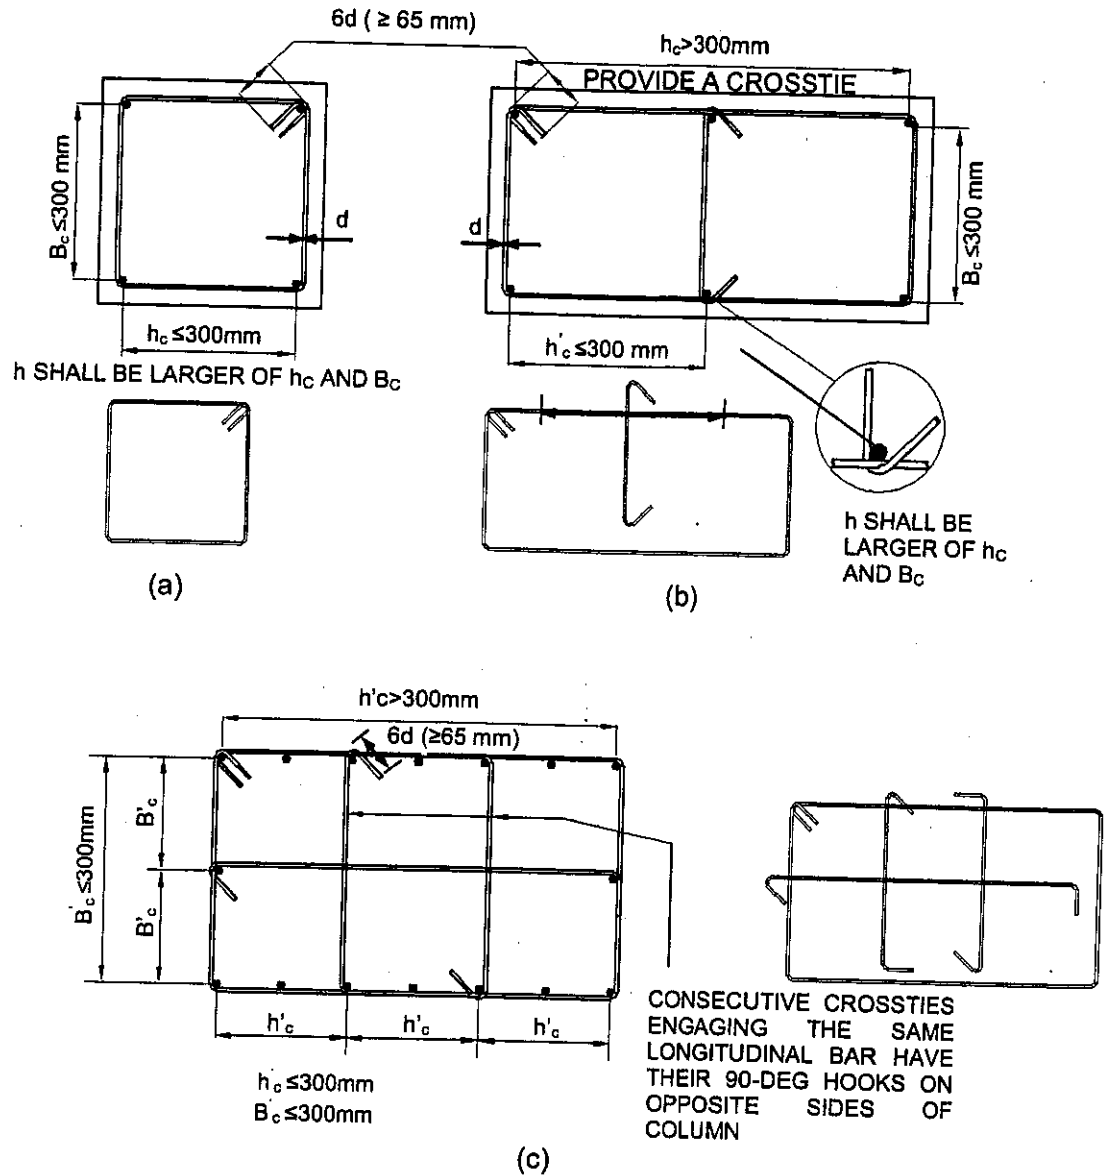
DETAILS OF TRANSVERSE REINFORCEMENT IN COLUMNS.
